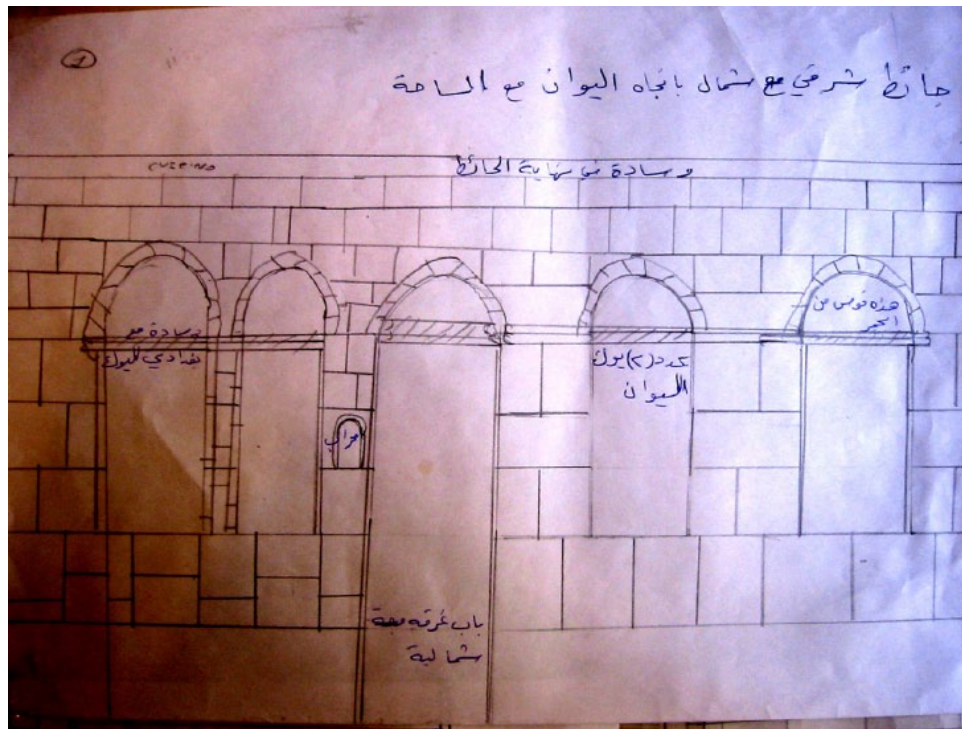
Mo'allemed Muhammad's drawing of a wall of the Arab house. © Photograph: Domenico Copertino.
